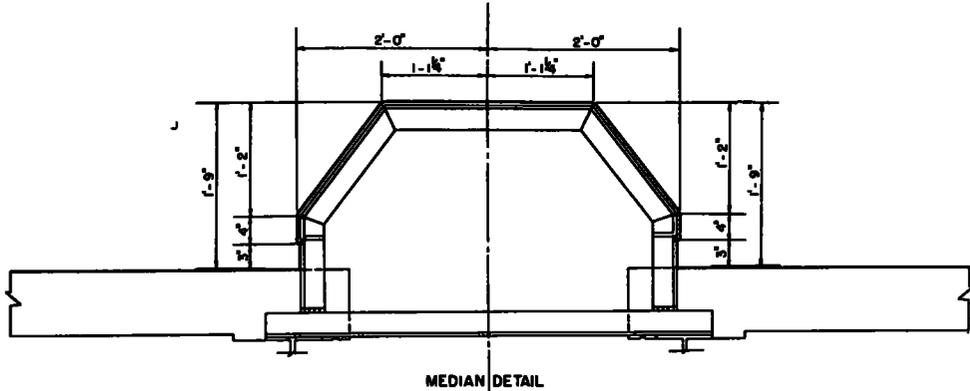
shows the roadway cross section and an enlarged cross section shows details of the medial divider. The total height of divider is 1 ft. 9 in. with the lower 7 in. having been constructed as a vertical section and the upper 1 ft. 2 in. laid back on a batter. The structure is speed zoned for 25 M.P.H.
